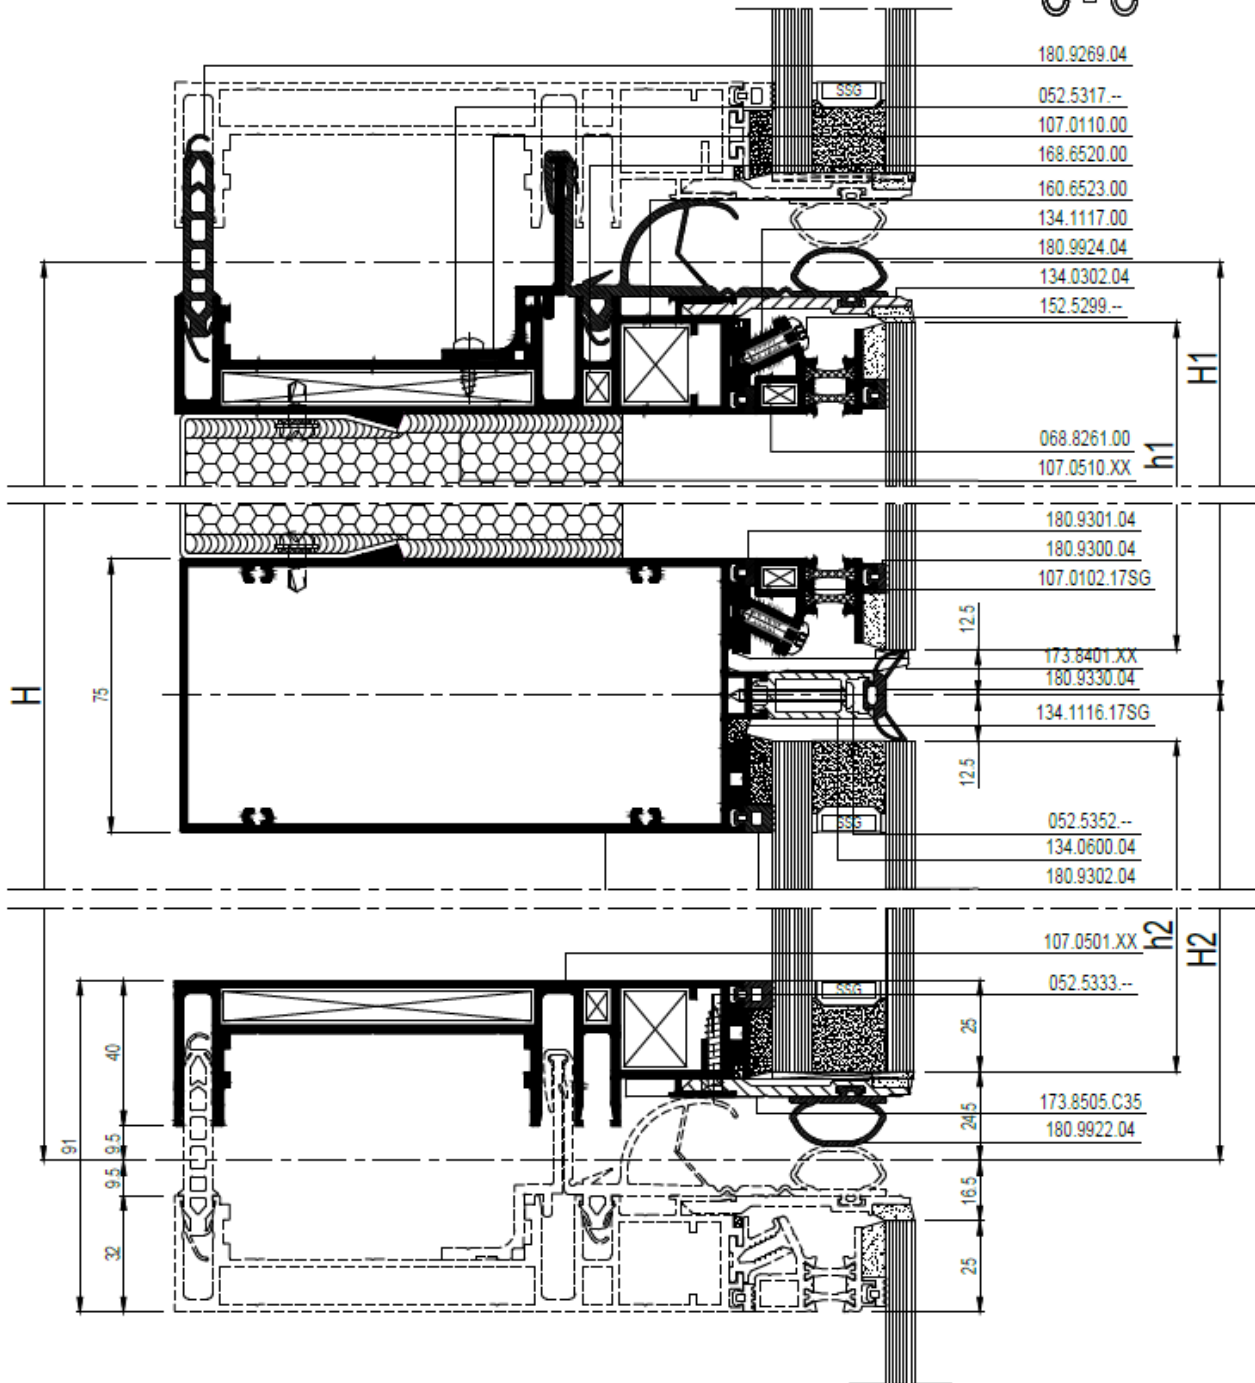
Structural sealant support frame : Vertical and horizontal cuts detail
